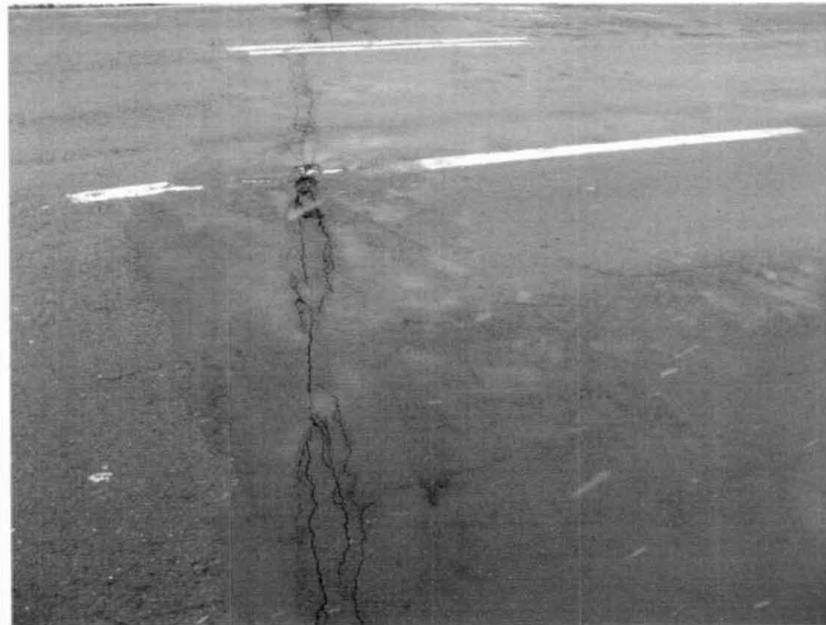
GENERAL VIEW LOOKING NORTH.
